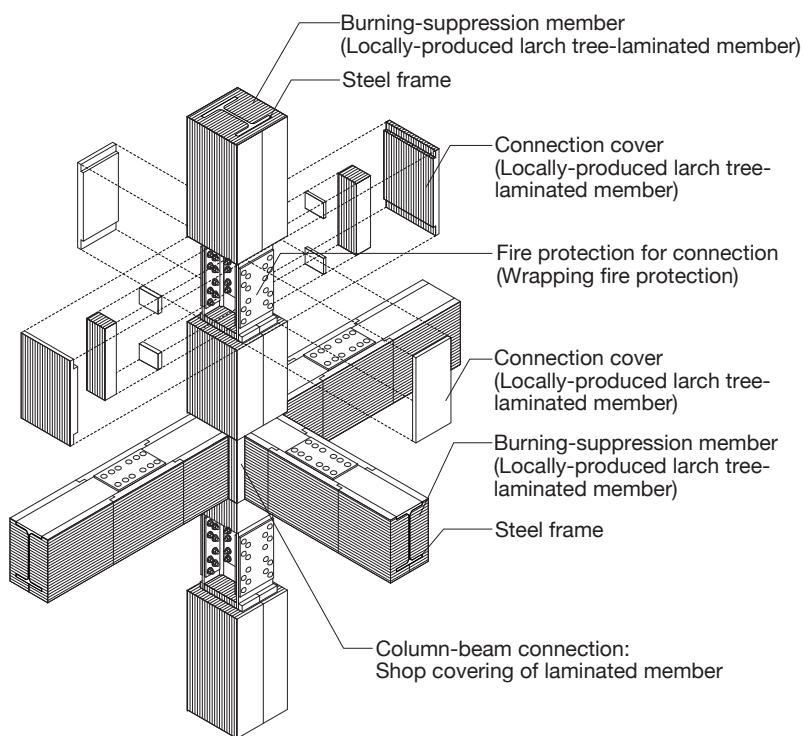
Wood-laminated hybrid member of the steel product built-in type
